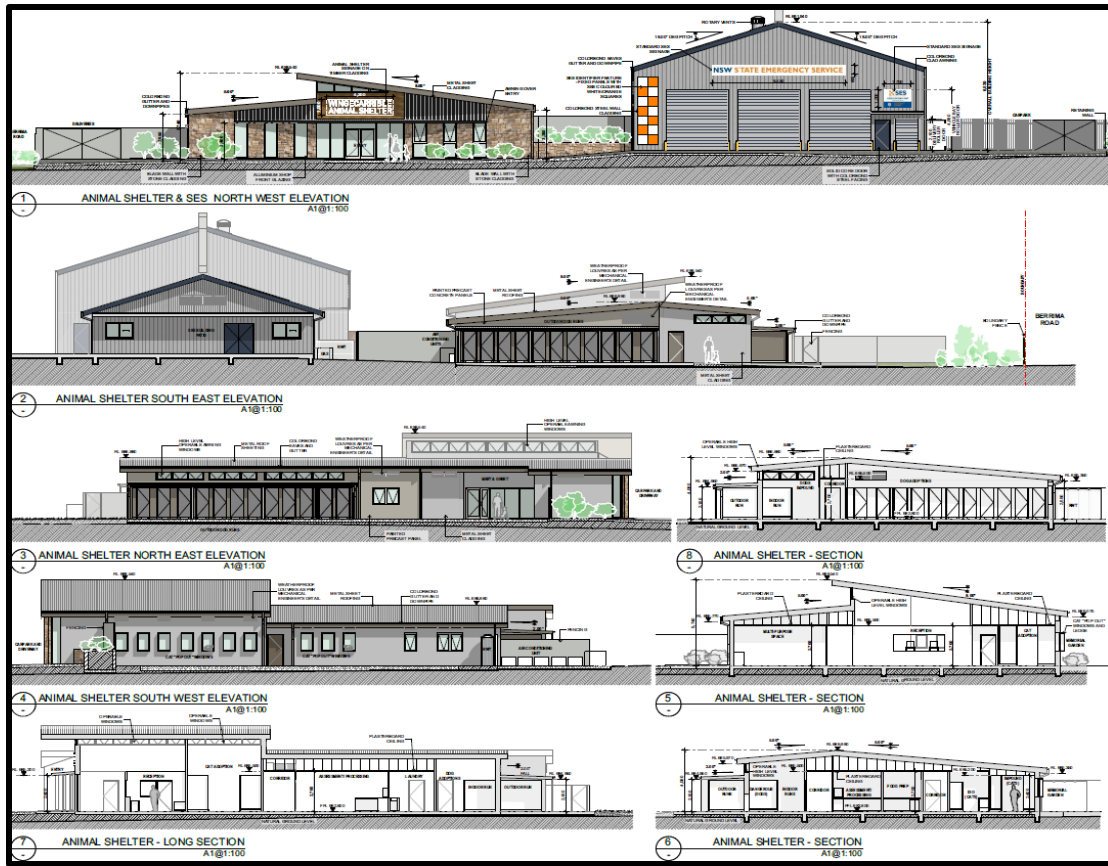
Elevations and Sections (Source: Figgis + Jefferson Tepa)
